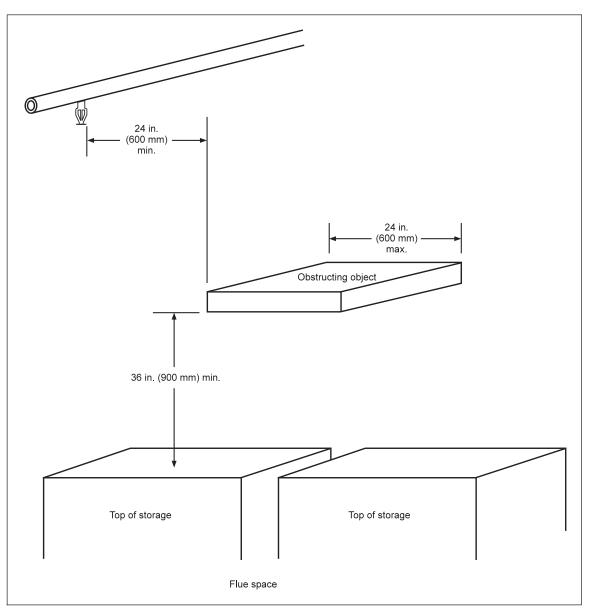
Obstruction area to inner core discharge pattern of pendent Storage sprinklers for objects over 12 in. (300 mm) and up to 24 in. (600 mm) wide
